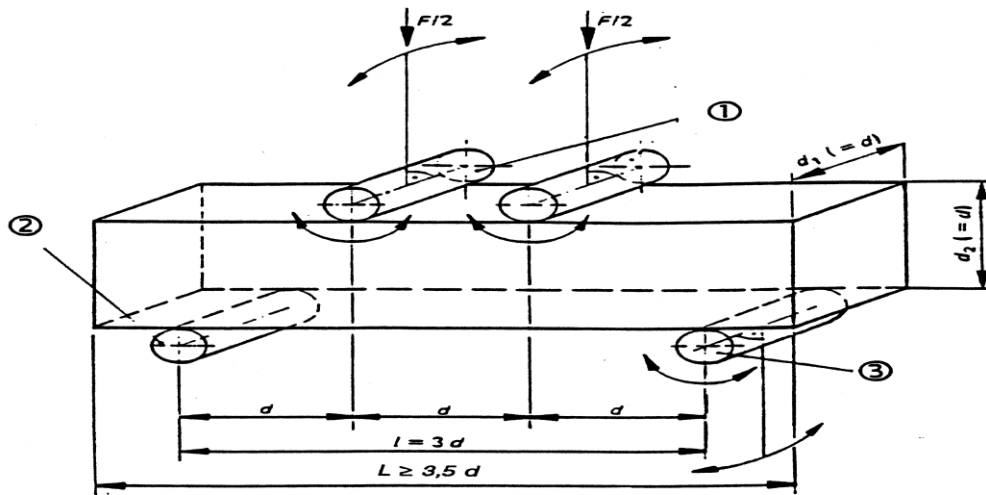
Two-Point Loading Arrangement of Loading of Test Specimen (BS EN 12390-5)
